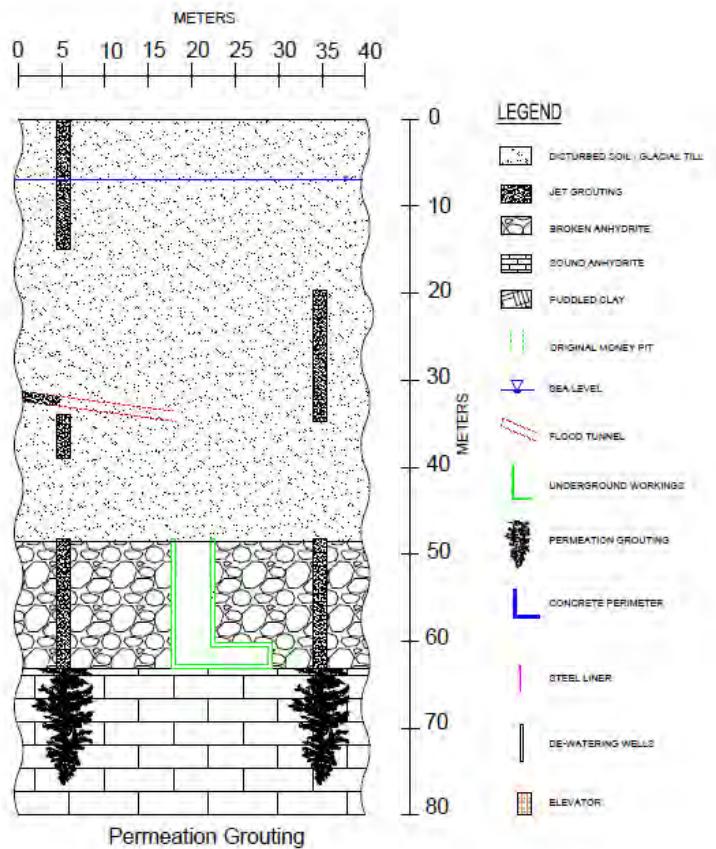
Cross-section of the permeation grouting profile in the broken anhydrite
